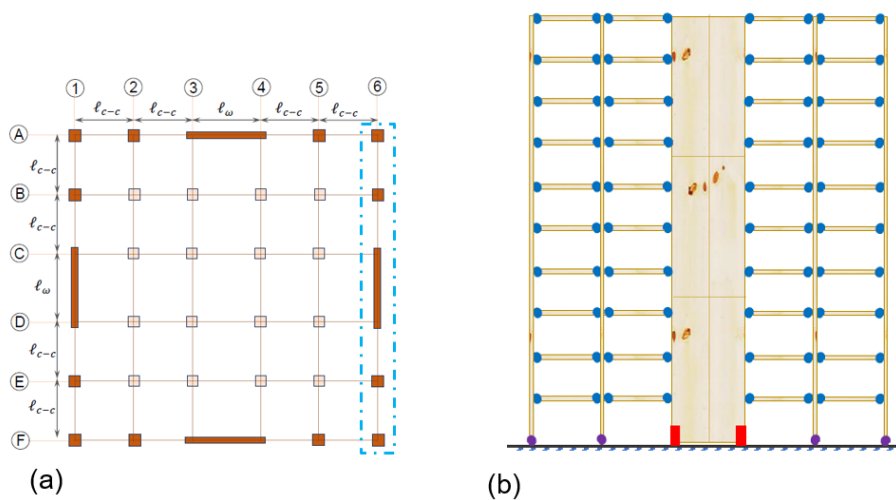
CLTW-GMRF system: a) plan view and b) lateral load resisting system.
